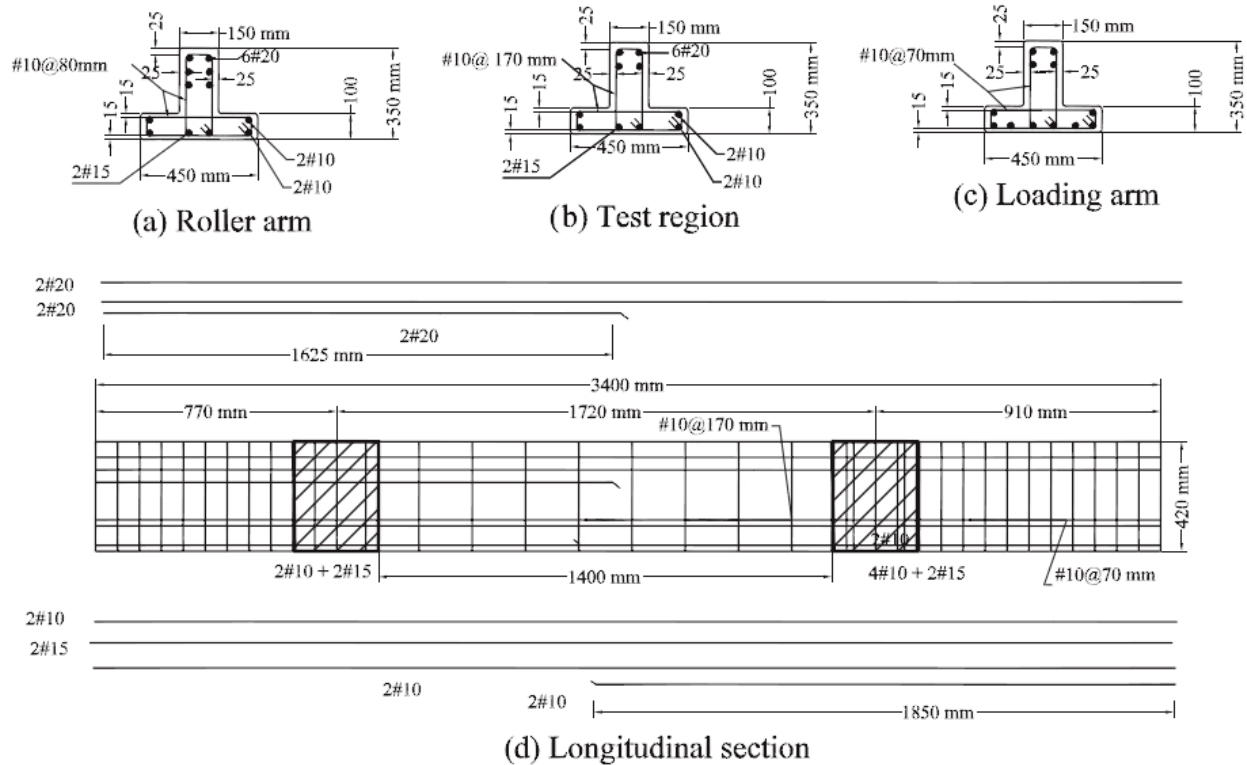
Dimensions and Reinforcement Details of Tested Beams (Deifalla and Ghobarah, 2014).
